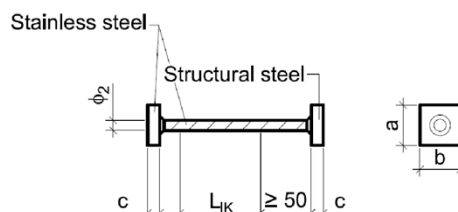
Steel compression element with welded-on compression plates, embedding at least 50 mm on one side, less than 50 mm on the other side (e.g. for Schöck Isokorb® Typ O)
